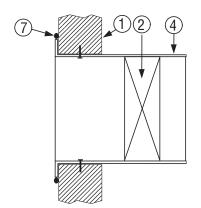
Out of Wall damper with flanged sleeve for grille mounting
